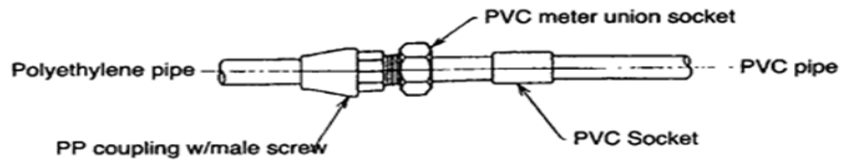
Connecting PE pipe to PVC pipe by PE male coupling/PVC union socket
